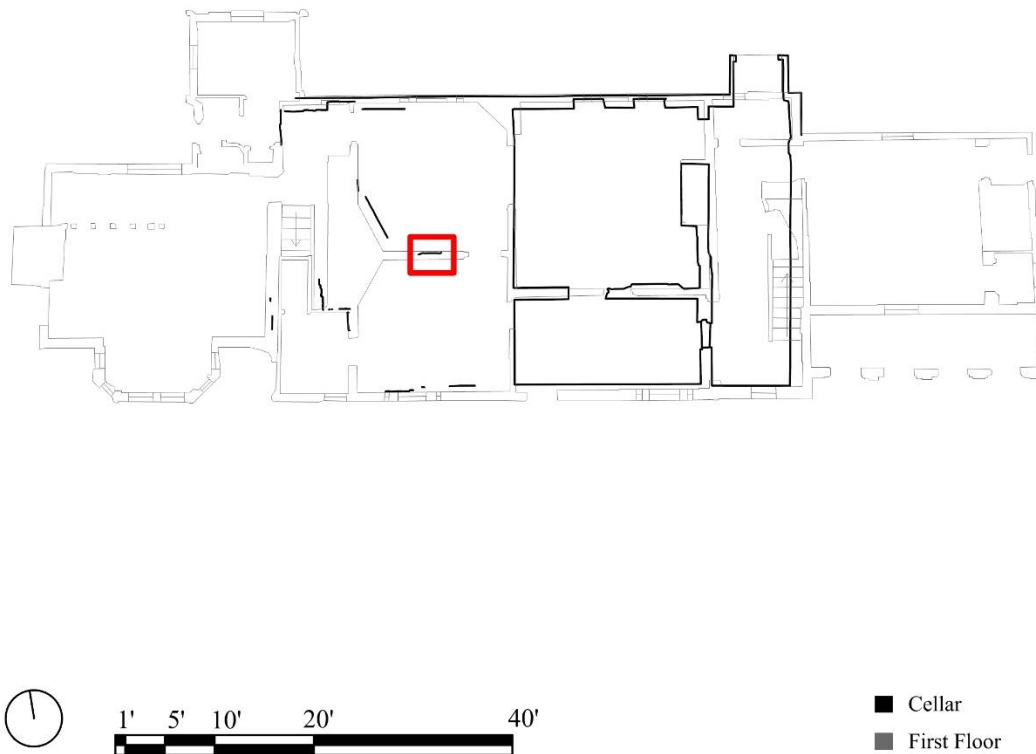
The cellar floor plan is overlaid over the first-floor plan. This reveals that the column seen from the northern brick wall is positioned under the interior wall dividing the two rooms in Campaign One.
